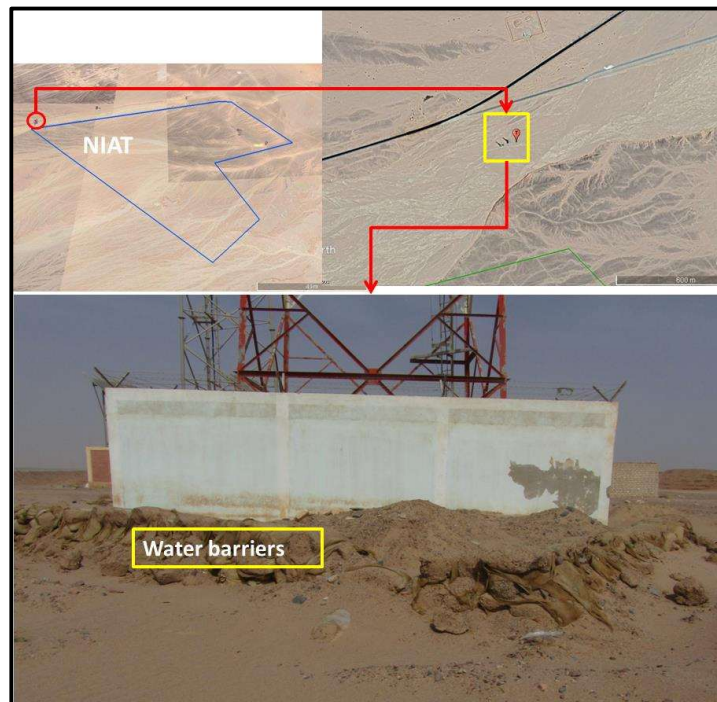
Containers Filled with Sand and Gravels Stacked Forming a Wall to Protect the Towers
